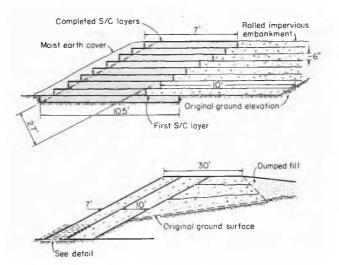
Details of compacted soil-cement facing for Bonny Dam test section.
